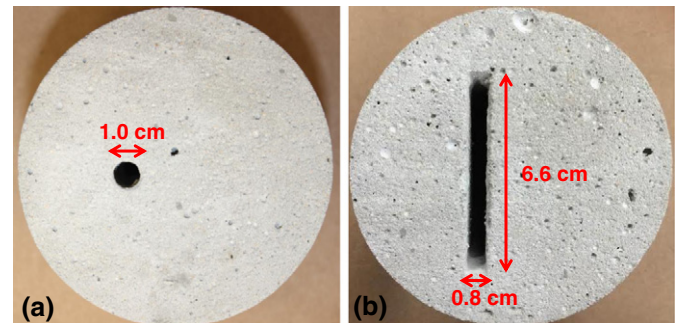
Specimens with physically-simulated cracks; (a) specimen with cylindrical through-crack and (b) specimen with plate-like crack.
